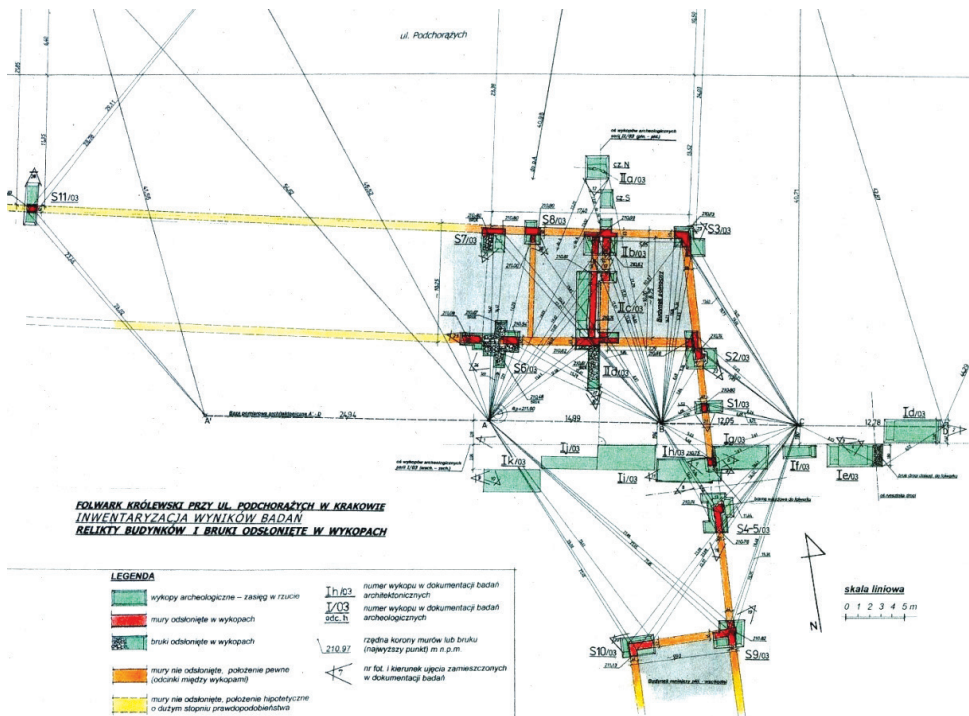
Excavation plan with exposed walls and pavement (source: [8])
